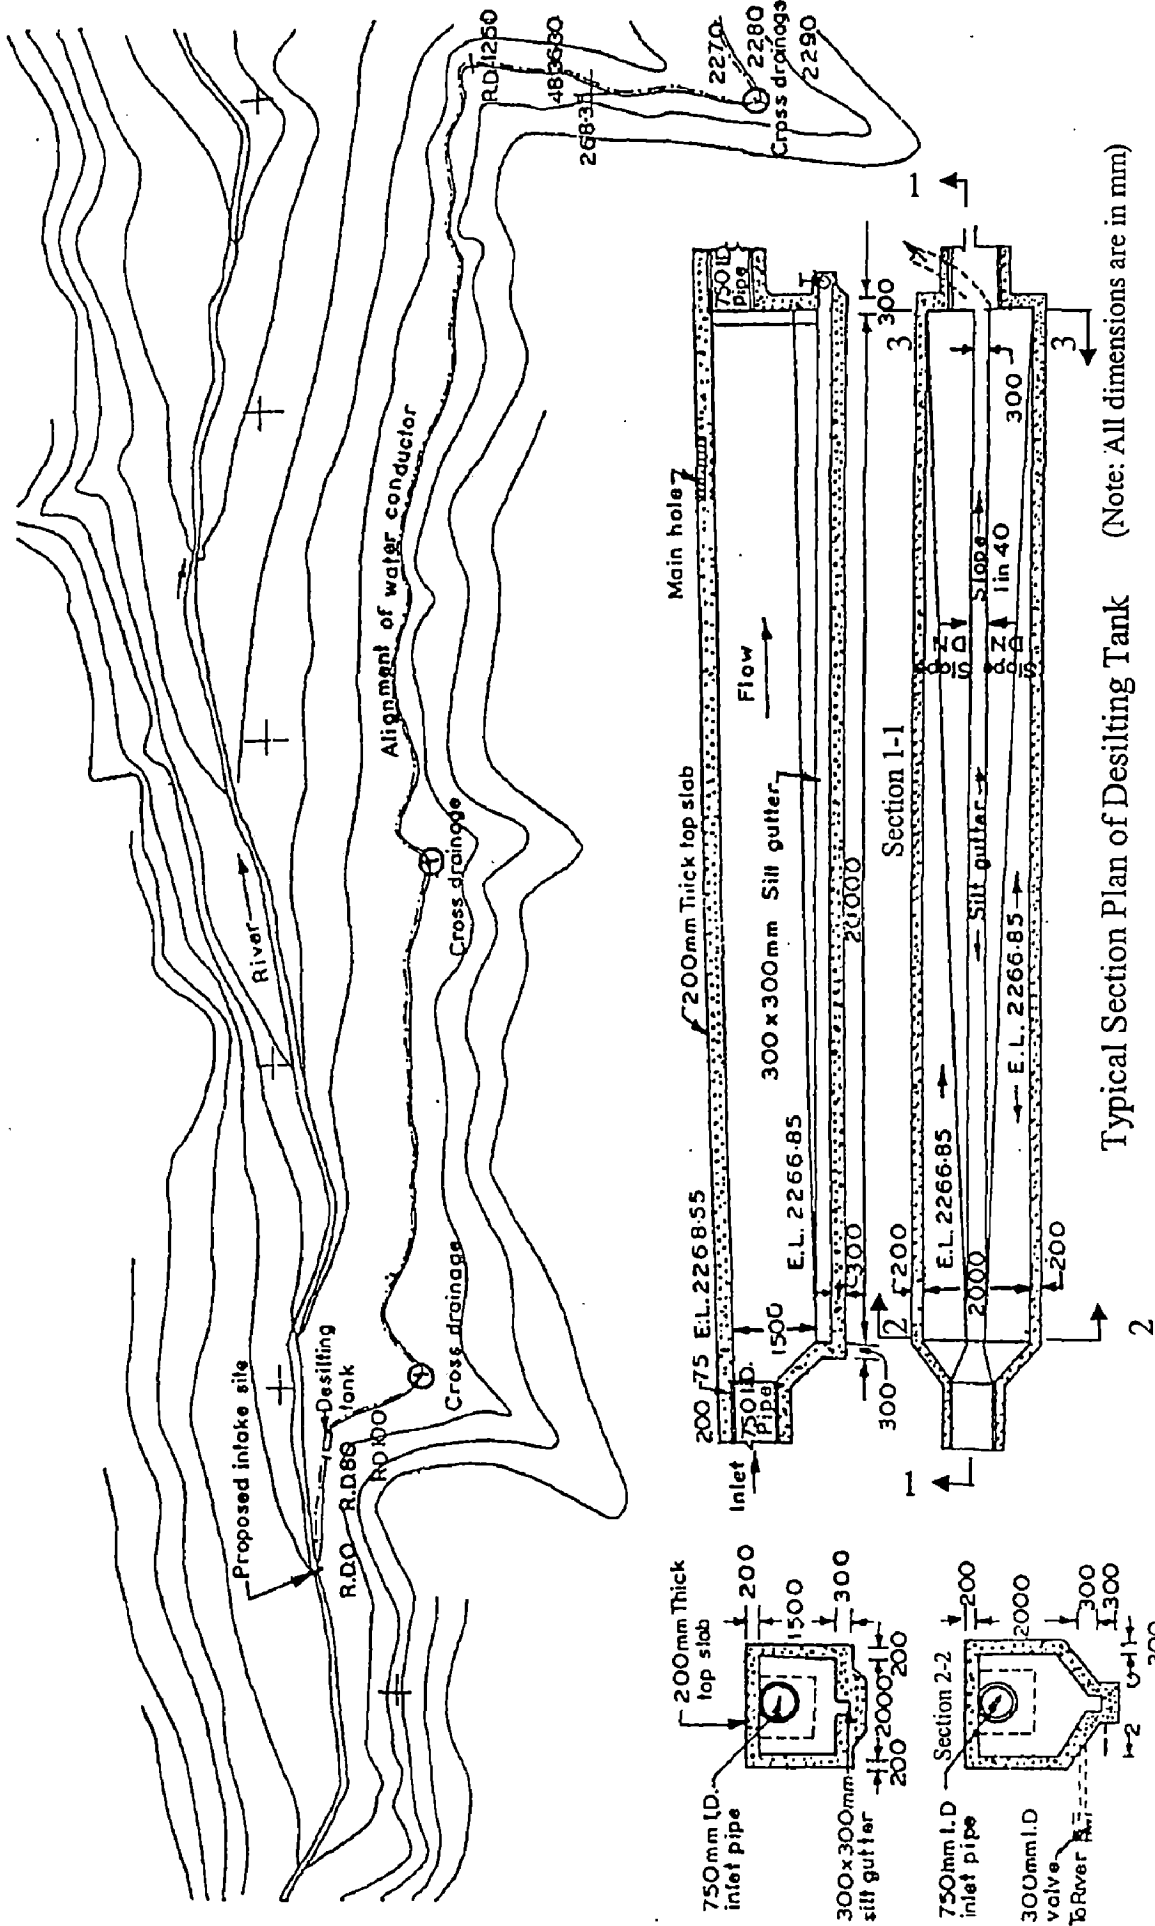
TYPICAL LAYOUT OF DESILTING TANK
